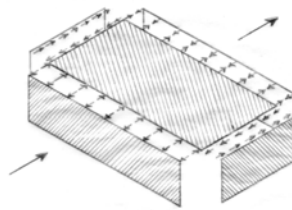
Principles of horizontal force distribution between walls and floors.
